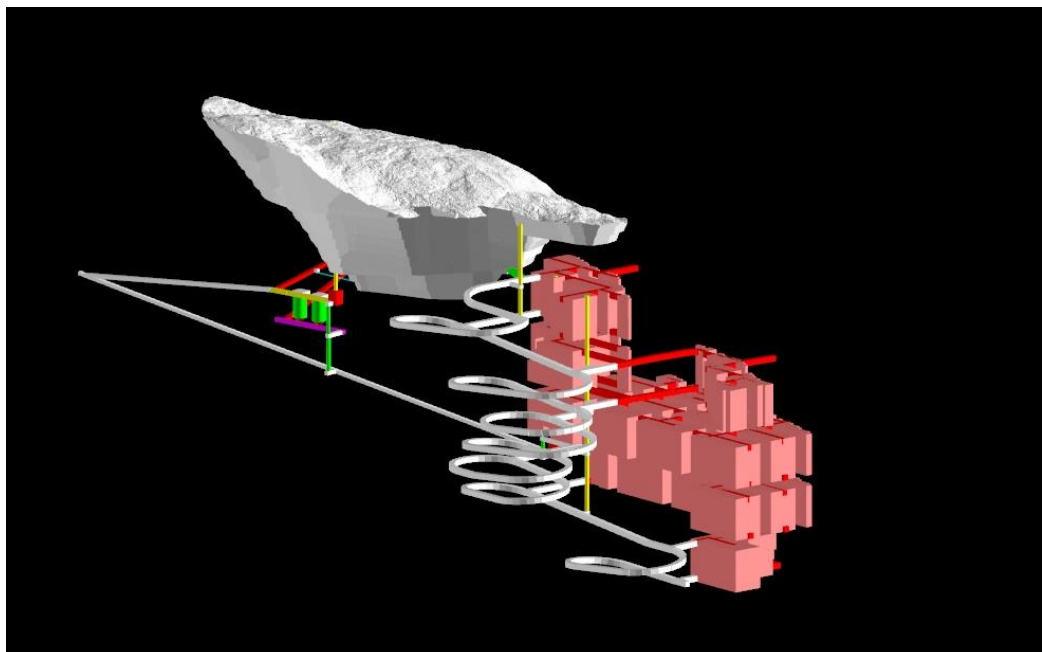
Open Pit and Underground Mine Plan (looking south-east)
